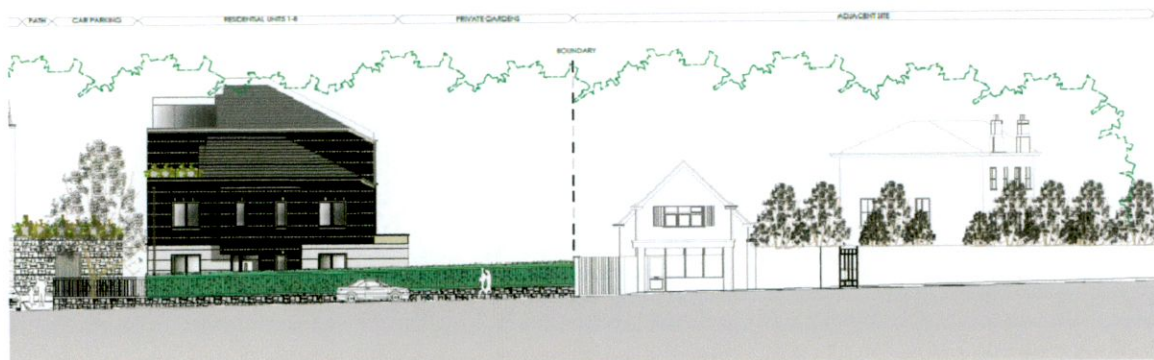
Current Proposal Contiguous elevation from Section 1-1
